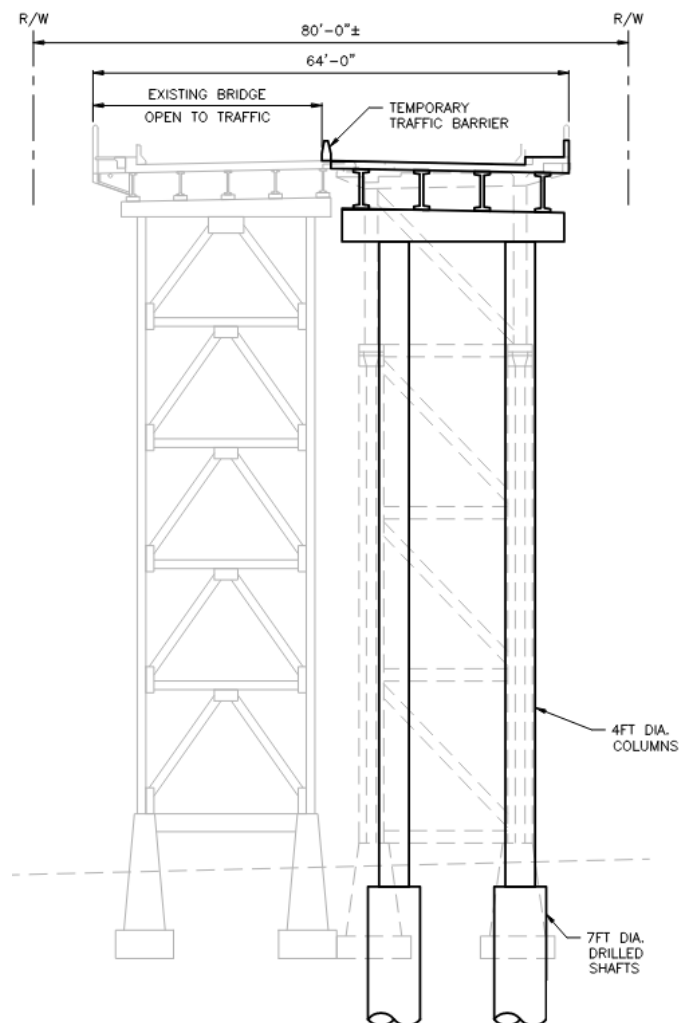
Alternative 2 – Staged Bridge Construction (First Stage Shown)
